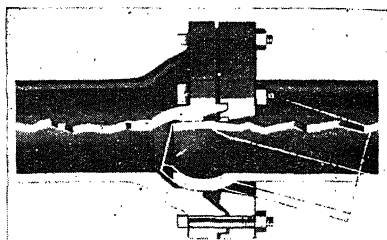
Ball-and-socket mechanical joint for cast iron pipe.
